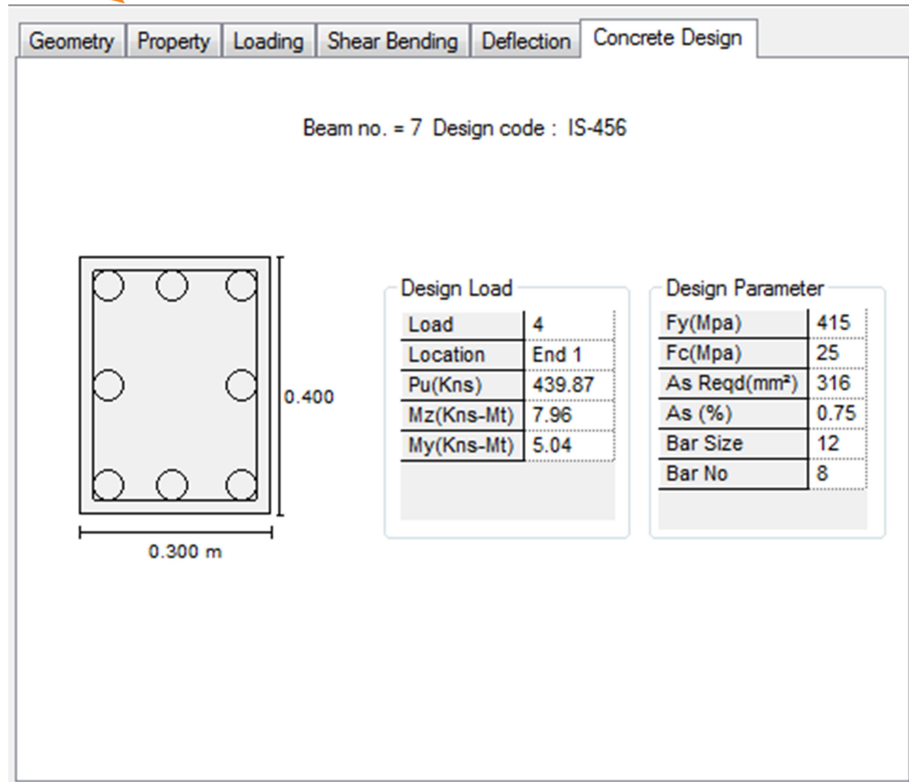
Diagram of Reinforcement Detailing of Column
